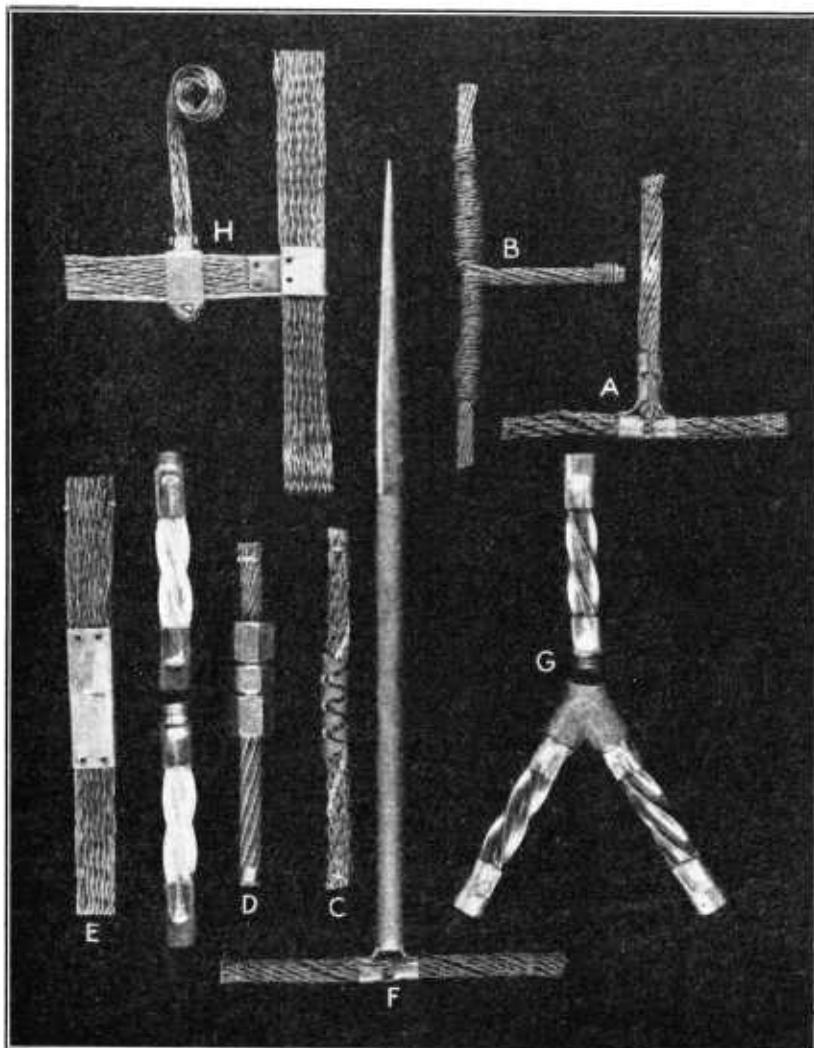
Conductor joints and air-terminal connections to main conductor. A, right-angled joint of copper cable, using a copper fitting. B, joint of copper cable made by wrapping strands of one cable about the other; the joint should preferably be soldered. C, D, and E, end-to-end joints of copper cable. C is a copper fitting wrapped about the cable. D, a solderless connector. E, a flattened copper tube with the cable ends inserted therein and all held together by nails driven through holes in tube to surface to which conductor is attached. F, right-angled joint of tubular air terminal to main conductor of copper cable. G and H, Y branch and end-to-end joints of star-section steel rod. I, right-angled joint of flat copper cable. Fitting for attachment of cable used for cross connection also shown.
